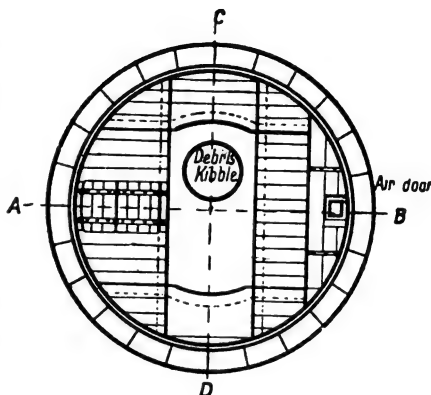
Plan of scaffold used at Newbottle Colliery.
